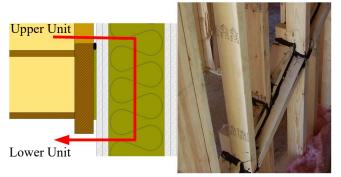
Left, section view (elevation) of entrance stairs and wall. The sound flanking path is shown in red. Right, view of the solid wood sound blocking pieces in a staggered stud wall, along the future location of the stair stringer.
